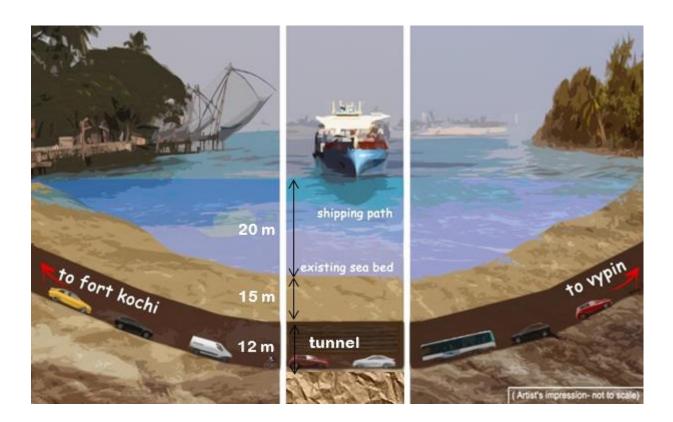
Schematic Longitudinal Profile of Tunnel
